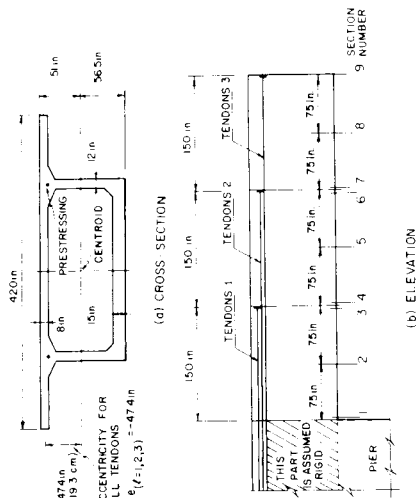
Cantilever Box-Girder Bridge Example (1 in. = 25.4 mm)
